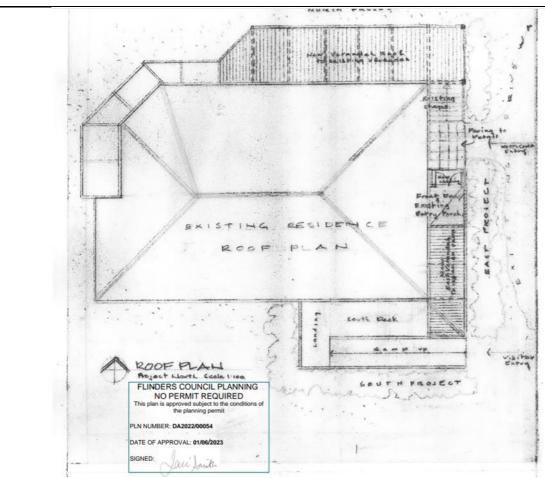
The deck to the south of the dwelling at 10 Munro Place.
